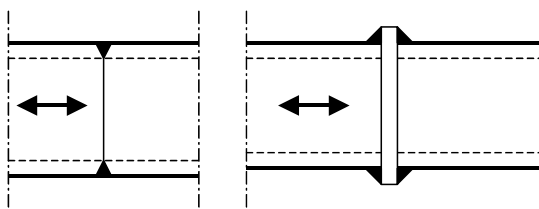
Butted RHS joint with V-groove weld or with a spacer plate and fillet weld.
